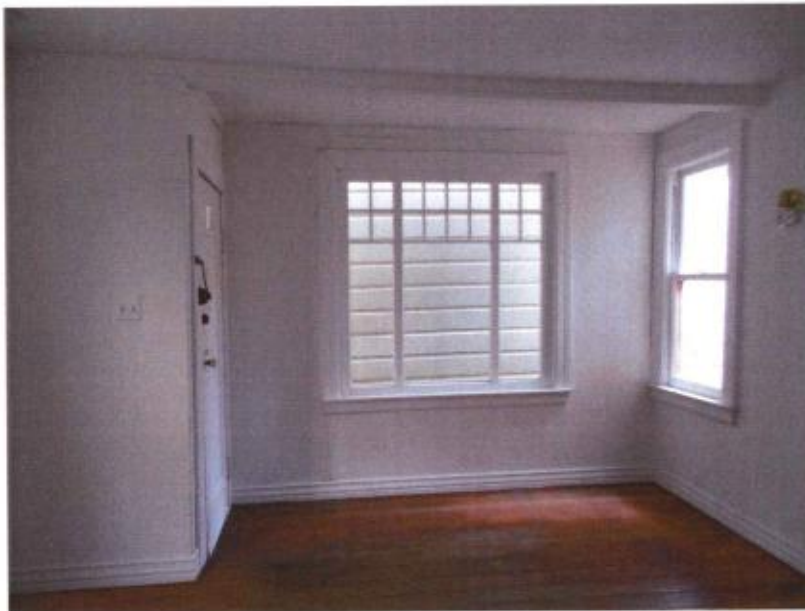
This photo shows the inside of the building at the main entrance. Note the sagging beam supporting the original roof framing at the interface of the new shed roof over the side addition. In addition, although it is hard to see in the photograph, the floor sags towards the property line.
